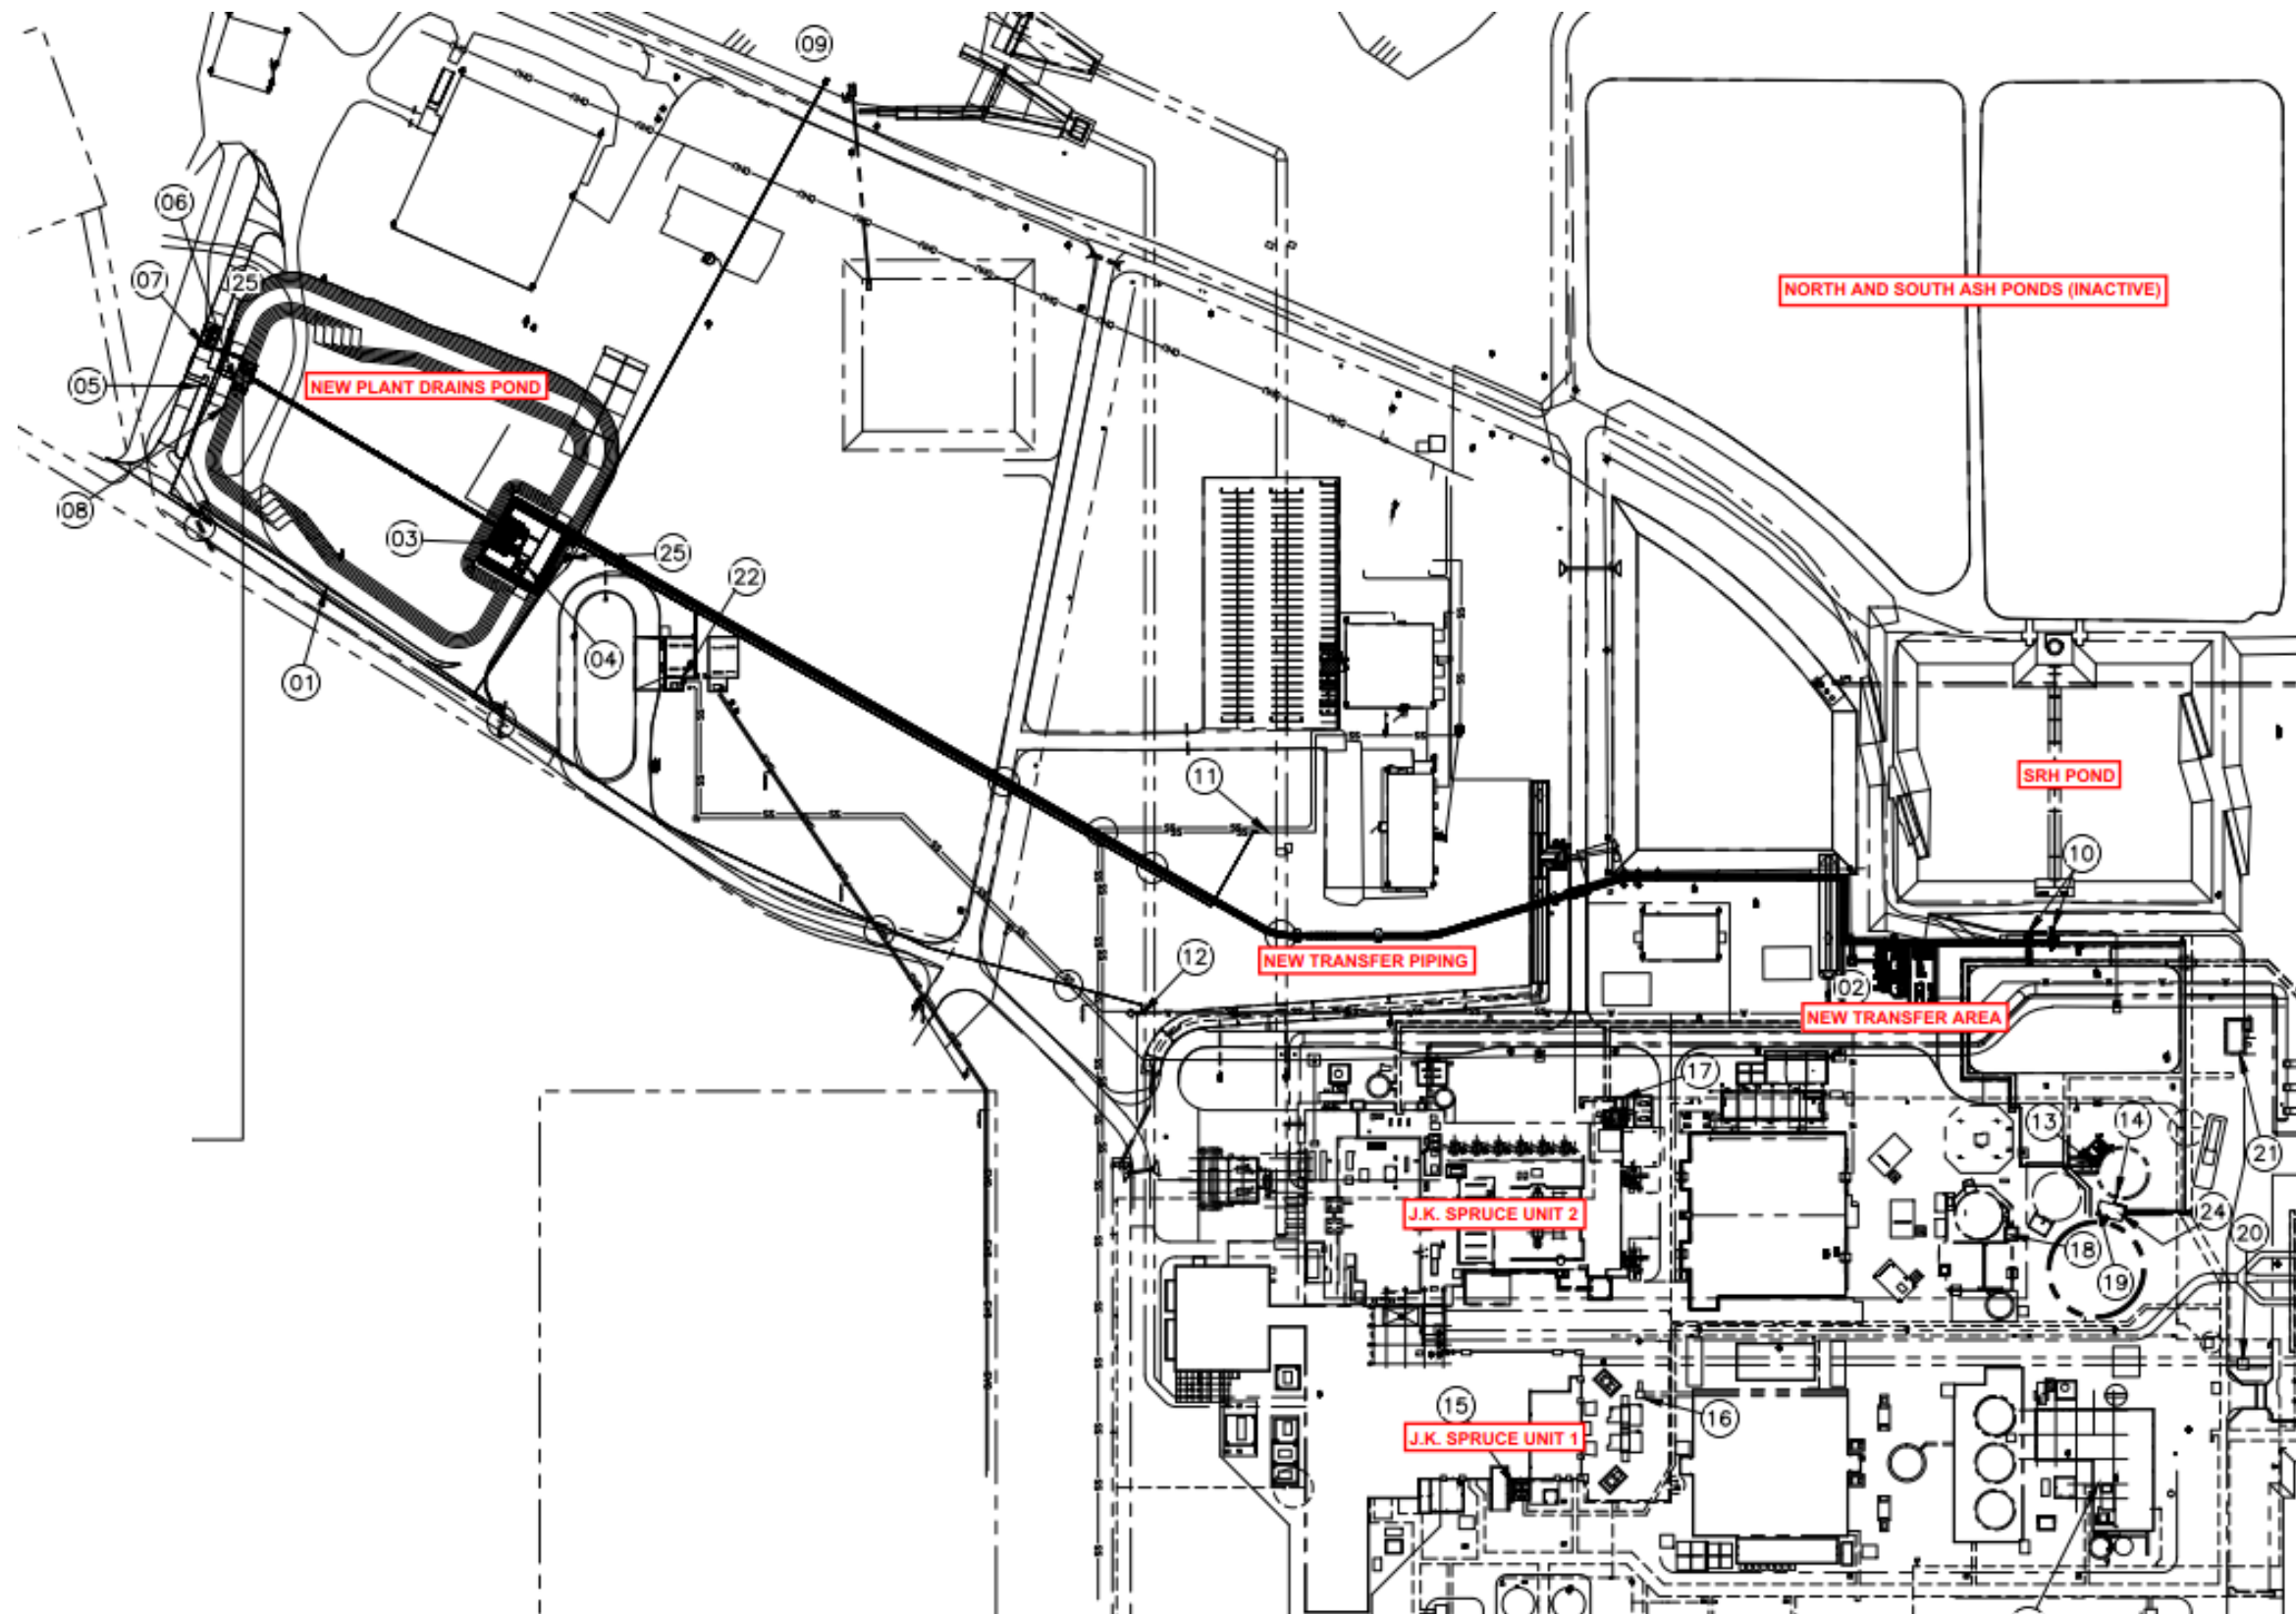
Overall Site Plan – Plant Drains Pond and Transfer System
